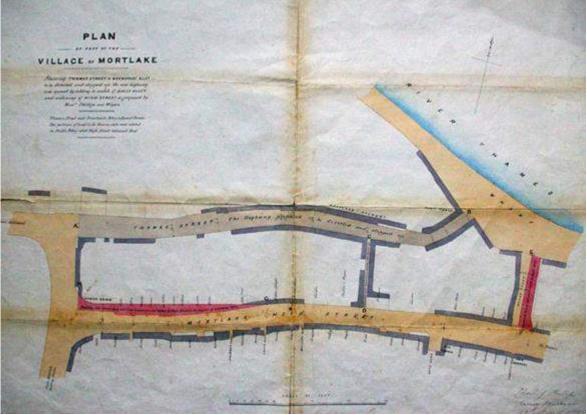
Plan of Proposed Works to Mortlake Brewery site, c. 1865
